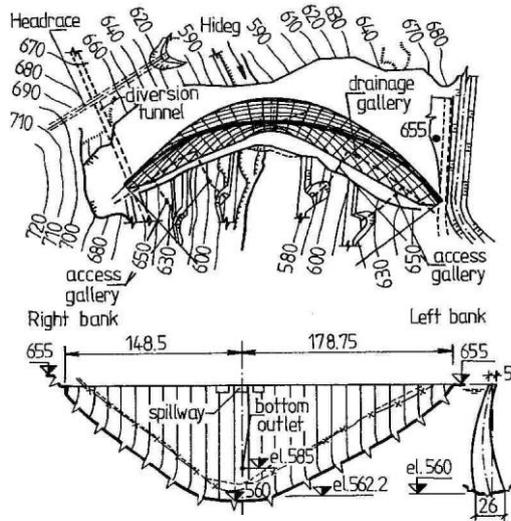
Poiana Rusca dam: plan view and longitudinal profile.
